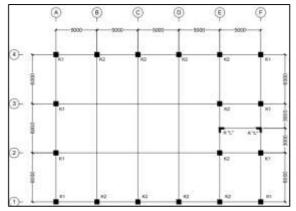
4th Story Columns Plan(Diaphragm Discontinuity Irregularity)
